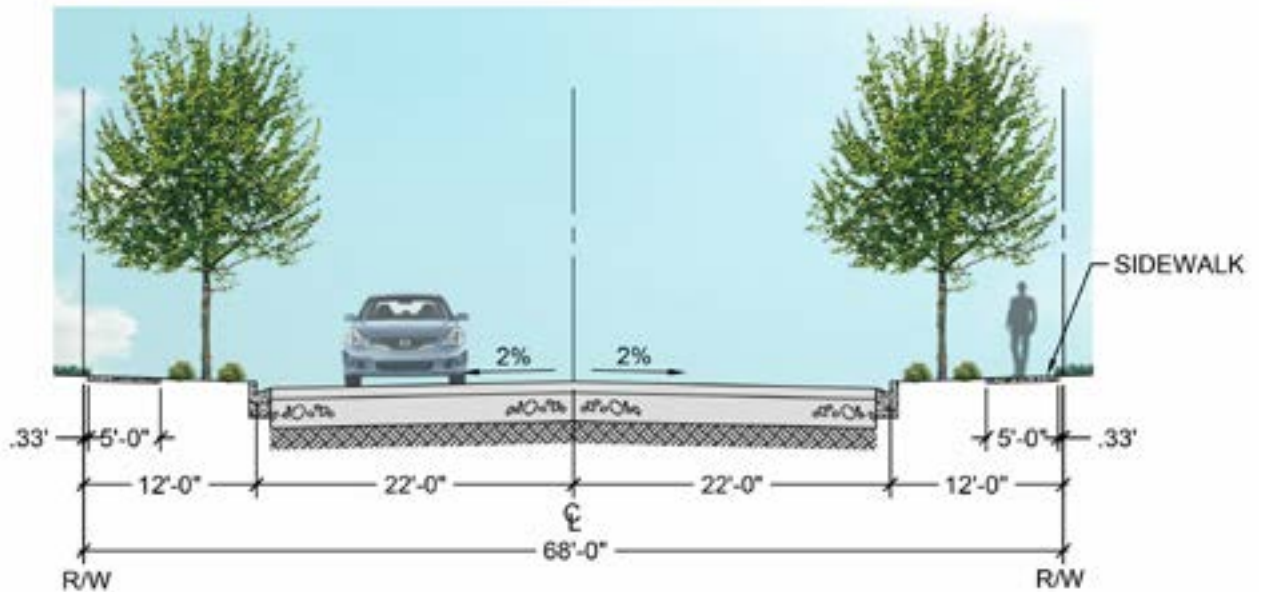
LANDSCAPED STREET SECTIONS
